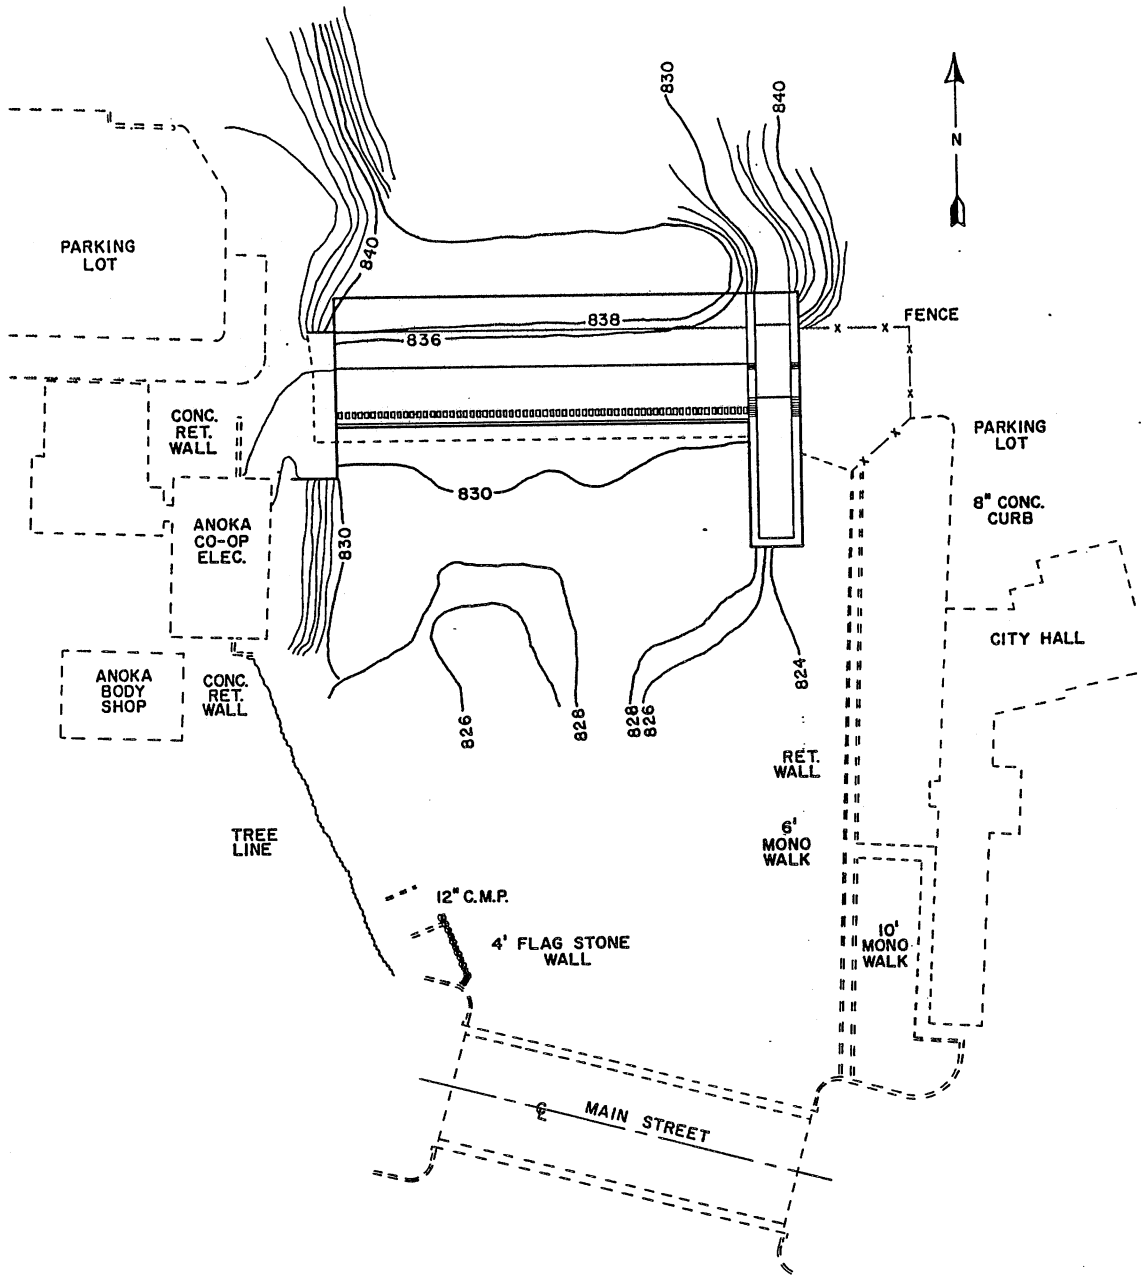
Plan view of the Rum River Dam at Anoka.
